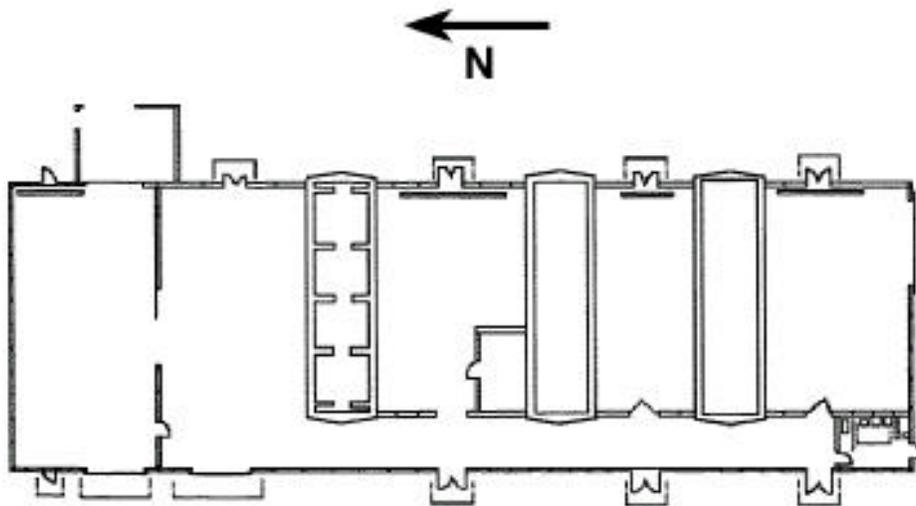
Floor plan of Building 907 based on the original drawings of the building.
